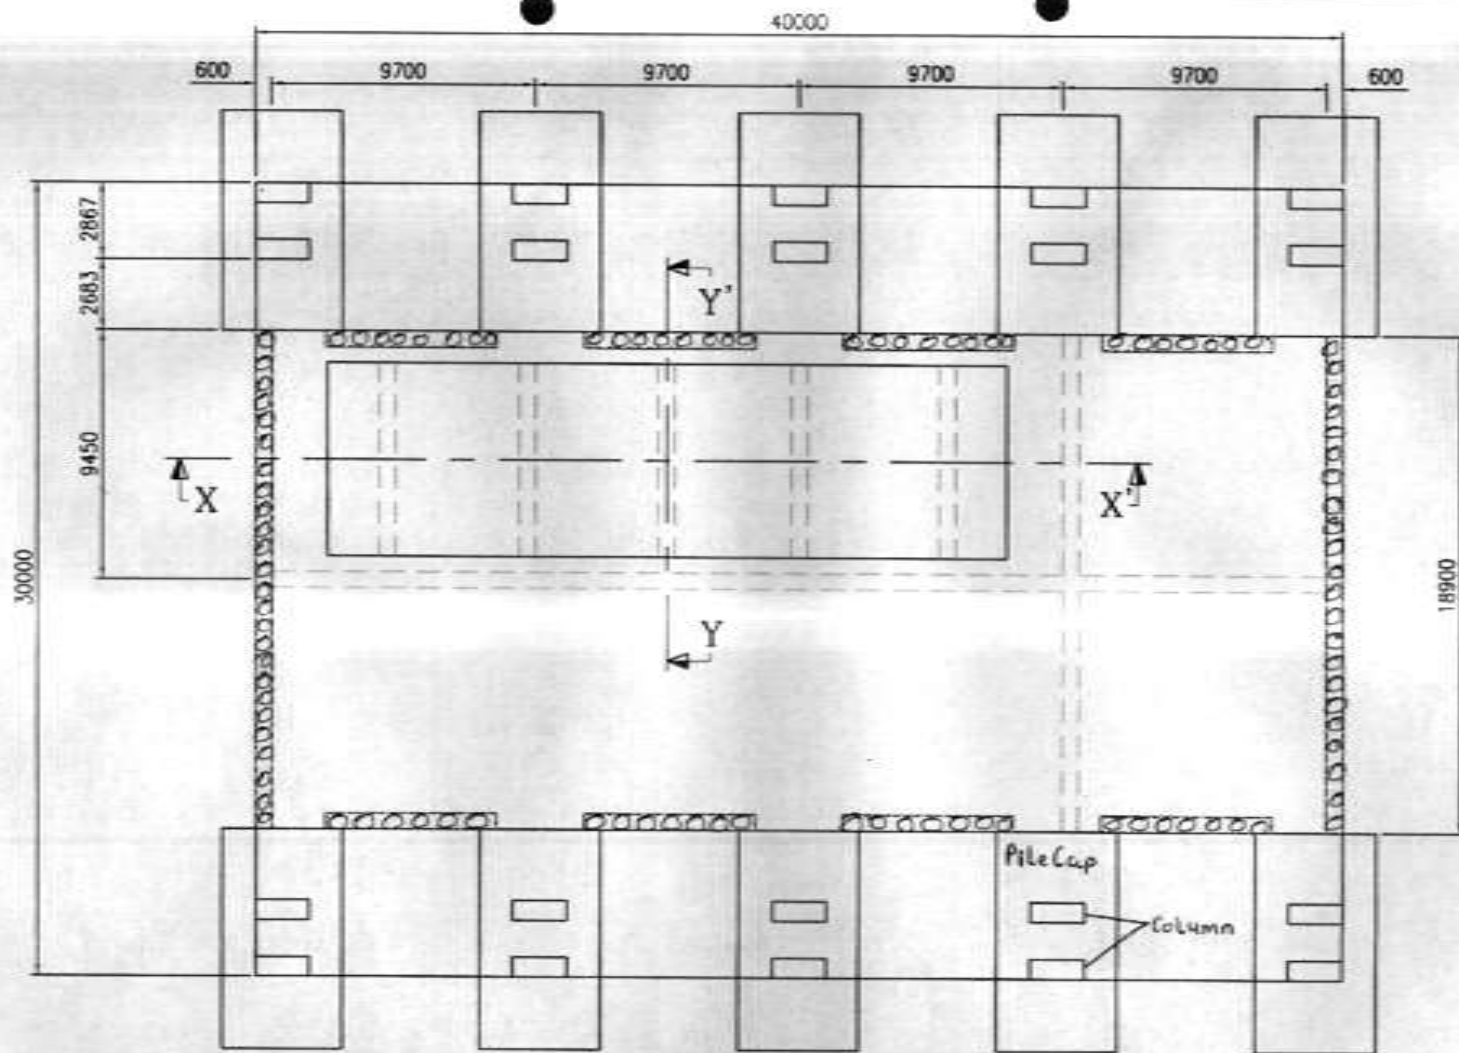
PLAN OF FLOOR showing Location of touching piles encloser between pile caps.
